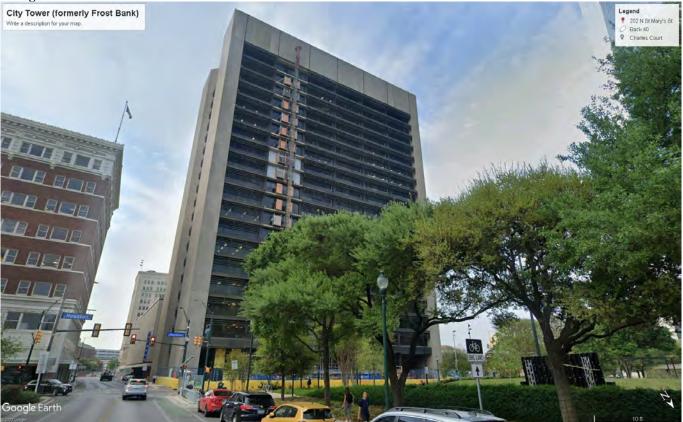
City Tower (old Frost Bank Building), San Antonio, Texas, photo courtesy Google Earth (02/2023), camera facing northeast
